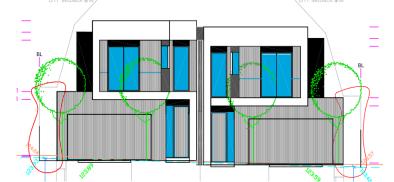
Street elevation. Plans considered by the Tribunal (decision plans).
